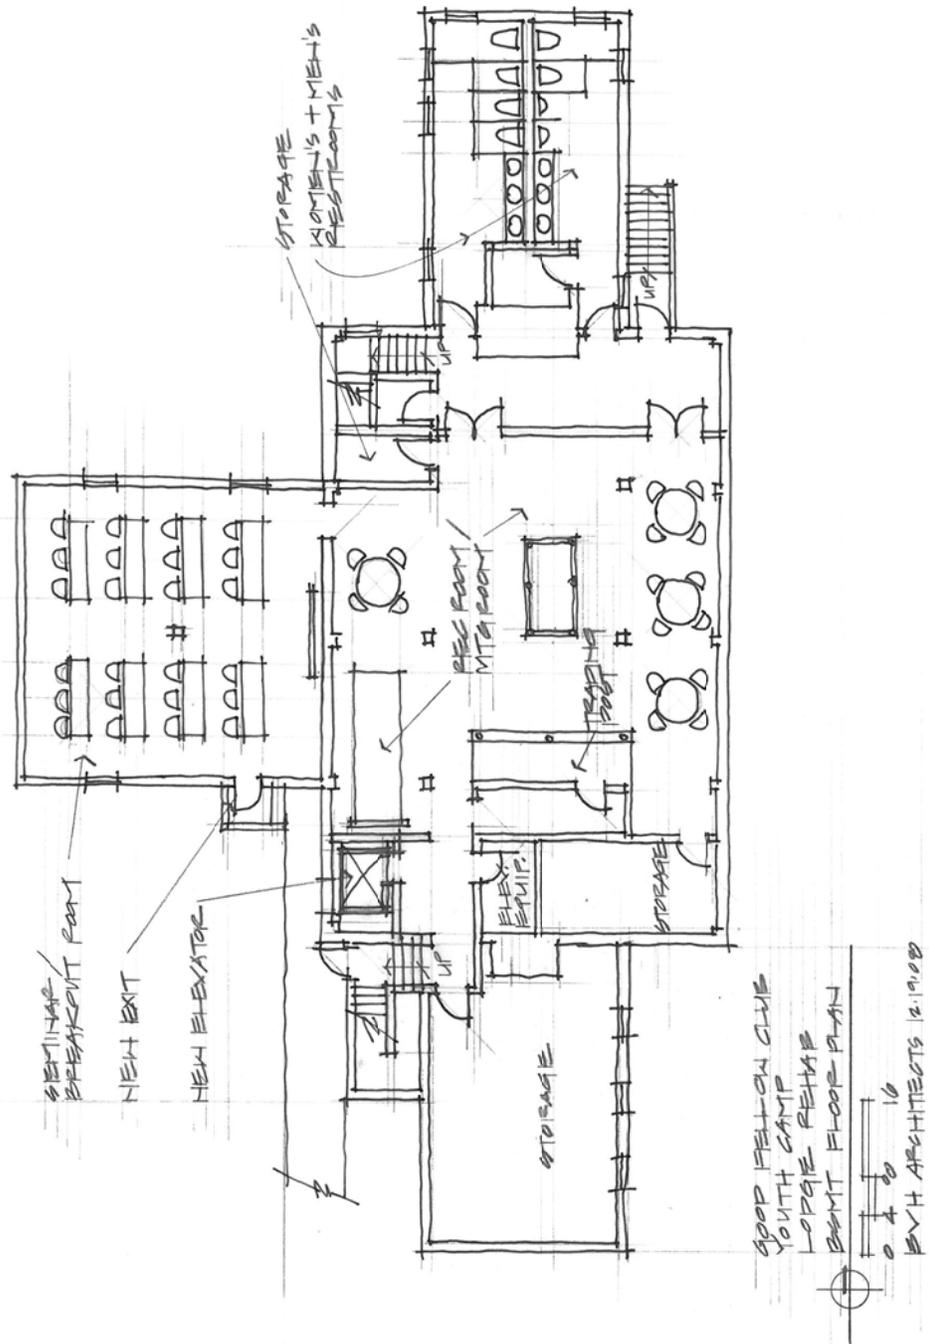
Lodge Rehabilitation: Basement Floor Plan.
